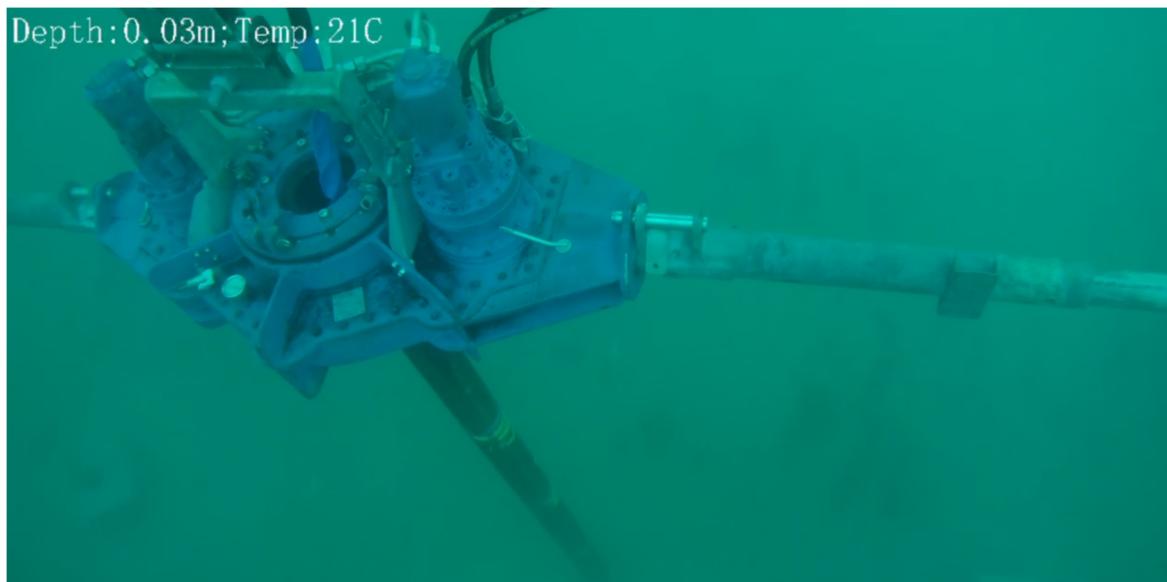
Suspended drill rig installing a screw anchor into the seabed (Source: DPIRD)
